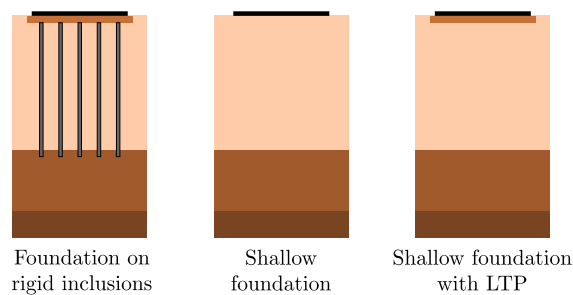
Layout of reinforced foundation and different shallow foundations
